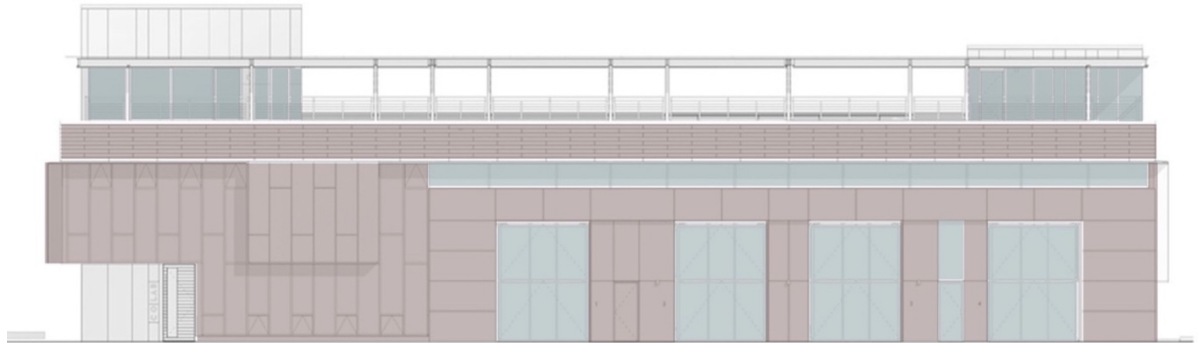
South Elevation. Reference: ArchDaily, edited by Author.
